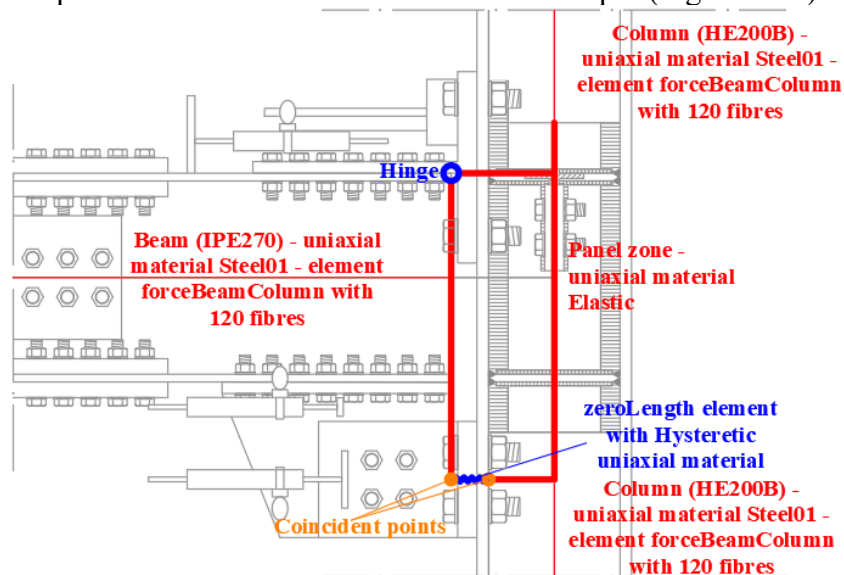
FE model of the beam-to-column connection (refined model)
